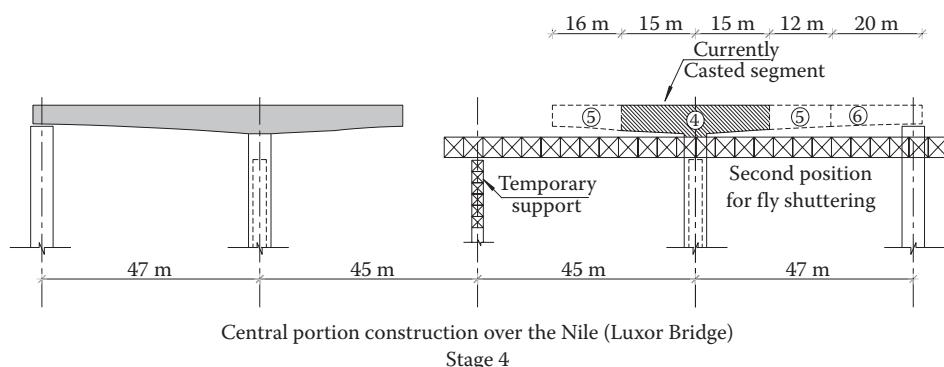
Casting the fourth segment after moving the shutting to the new position (west of the bridge).
